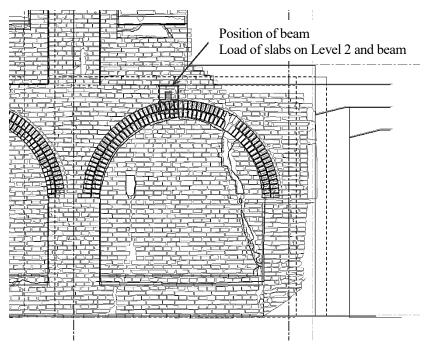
Drawing of damaged parts of brick walls
